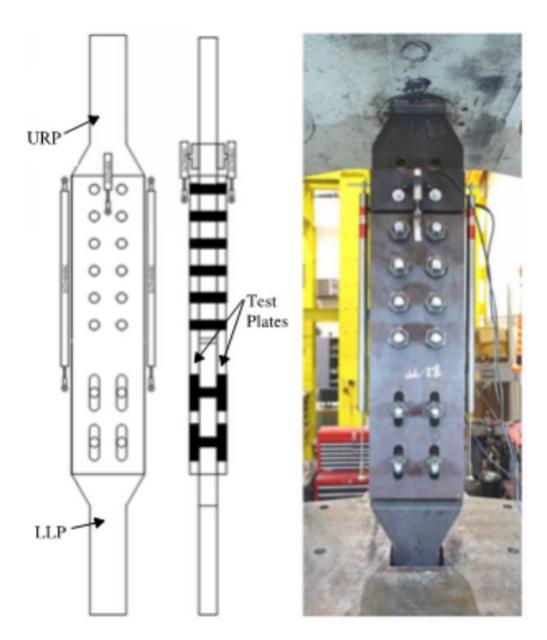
Wollenslegel Test Setup (Wollenslegel, 2020).
